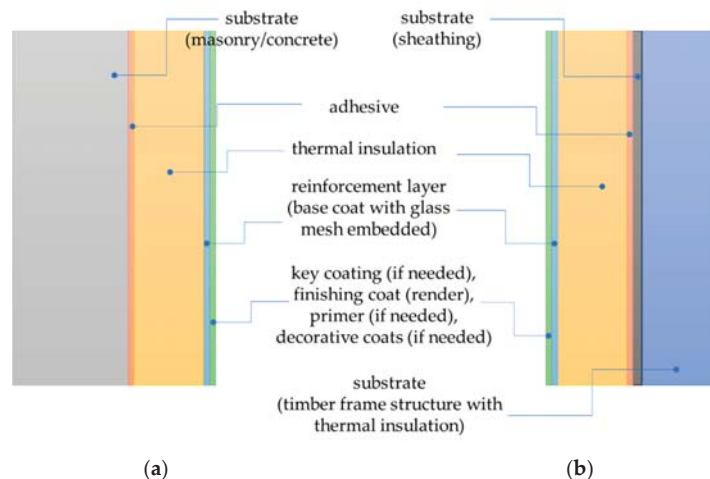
ETICS on (a) masonry or concrete wall, (b) on wood frame wall. Example of purely bonded ETICS.
